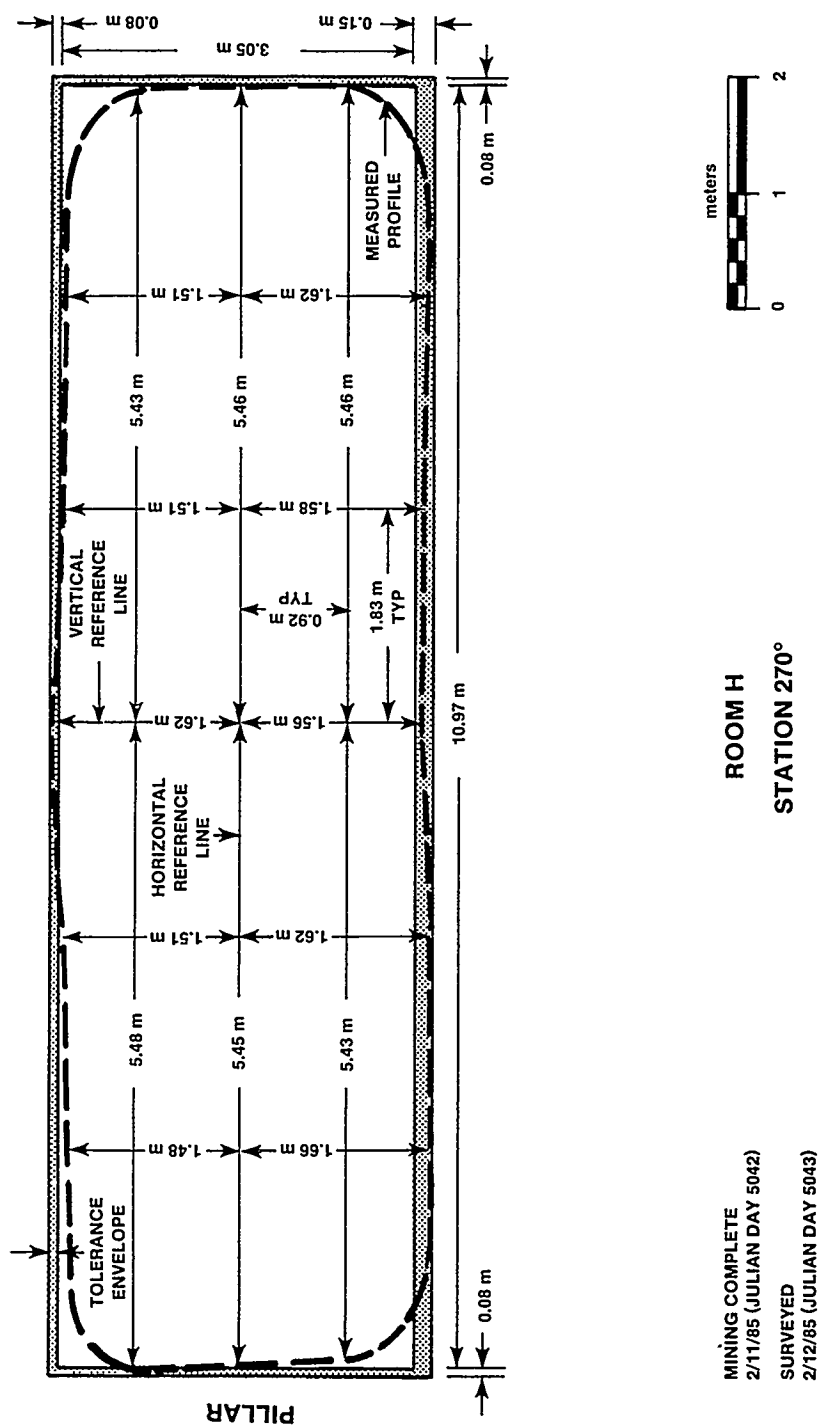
As-Built Cross Section of Station 270°, Room H
